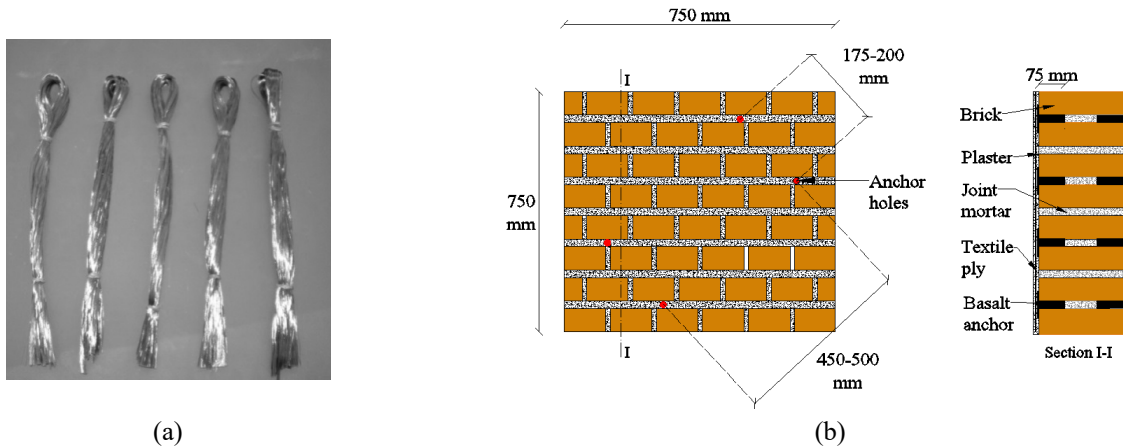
Anchorage details (a) basalt anchors, and (b) location of anchor holes
